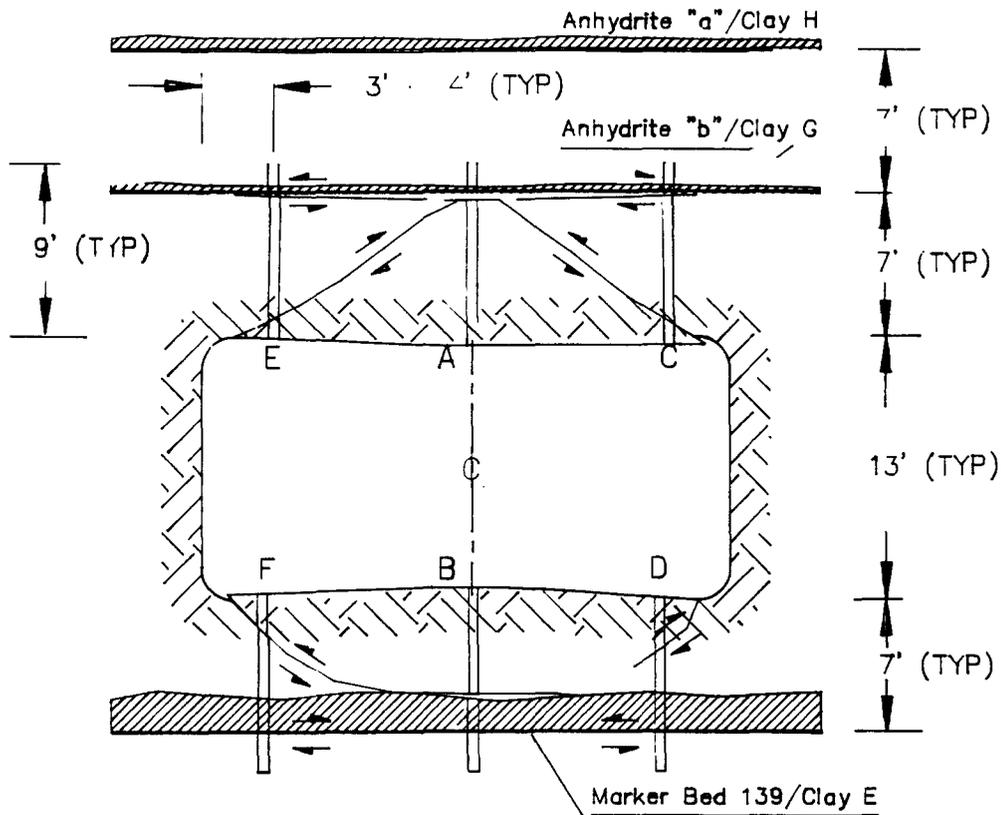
Typical Deformation Patterns Around Underground Opening At WIPP
